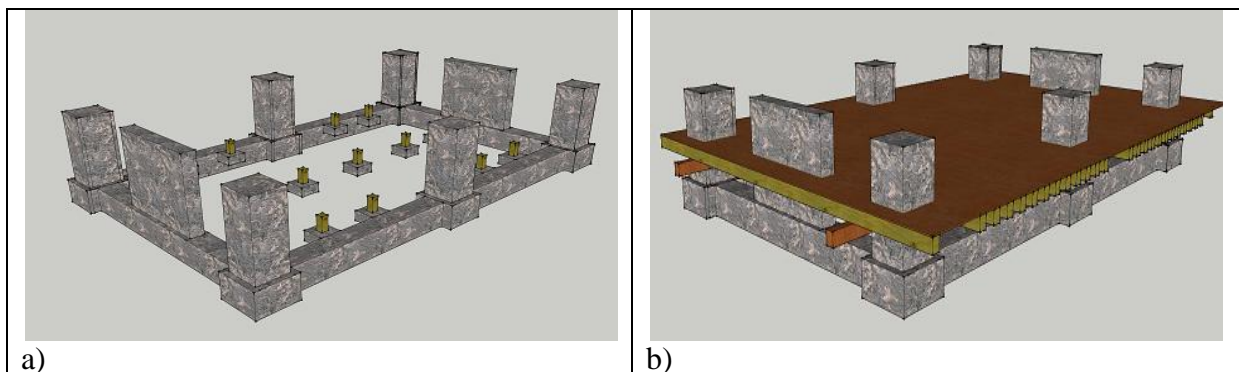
(a) Strip Foundation Beams, Column plinths, Wall Plinths and small footings and (b) Erect Wooden Ground floor
